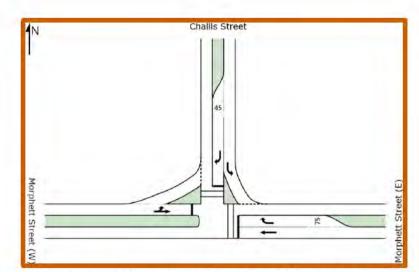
Recommended Layout for the Intersection of Morphett Street and Challis Street
